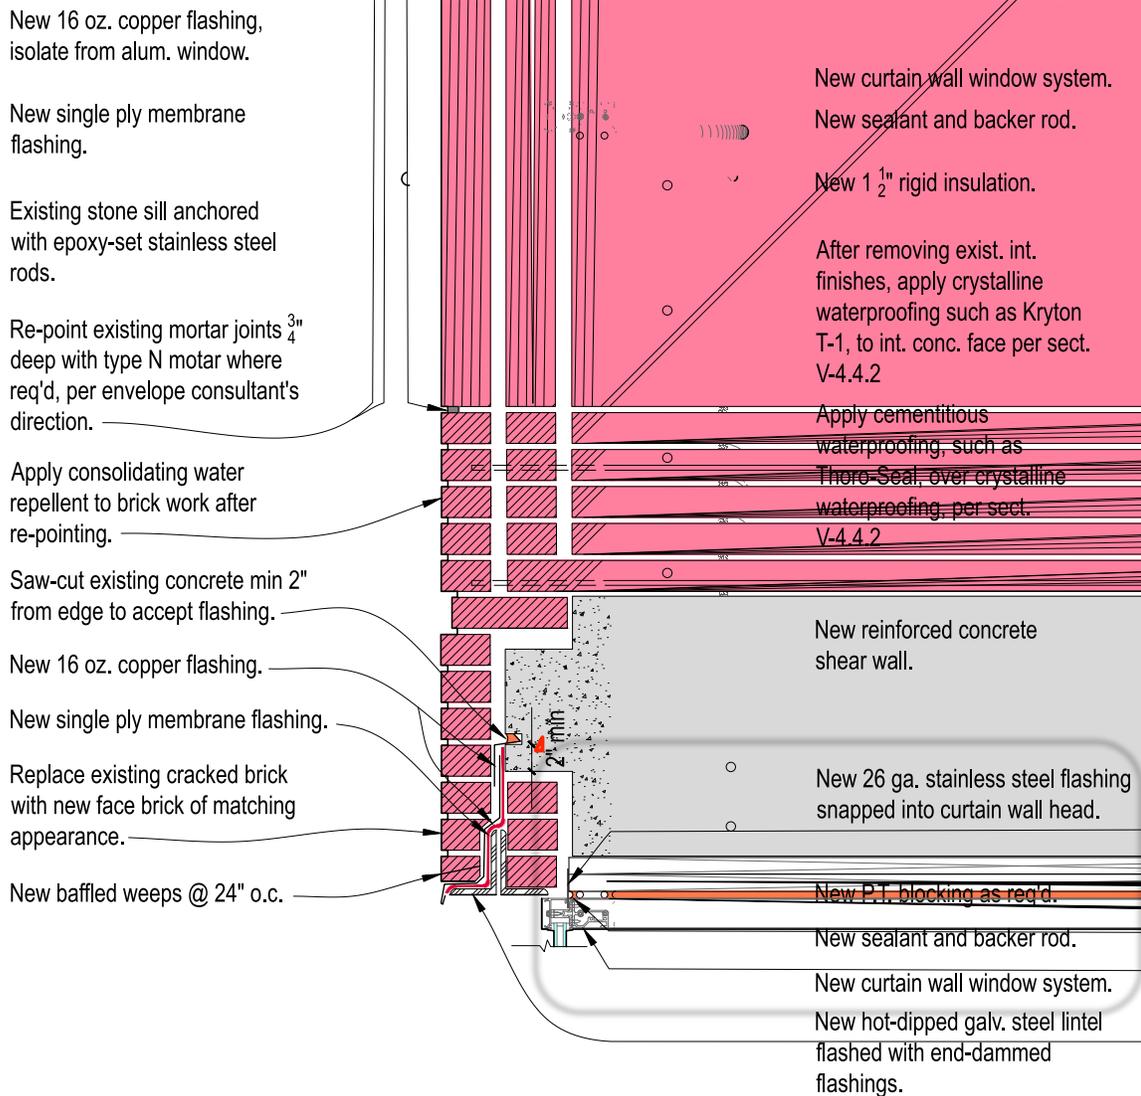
(2): Window Head & Sill Installation at Typical Brick Wall Loc.
